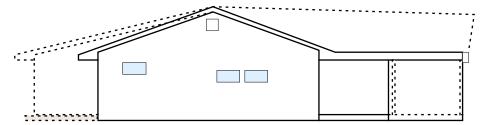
Elevation view existing house viewed from outside from east looking west. Solid lines and dotted lines to the north of the roof peak, (to the right in the diagram, towards the street) are the existing house. The dotted roof line to the north is in the middle of the occupied (i.e. non-carport) part of the north part Dotted lines to the south give an elevation view of the addition. The small rectangle is the location of possible heat
